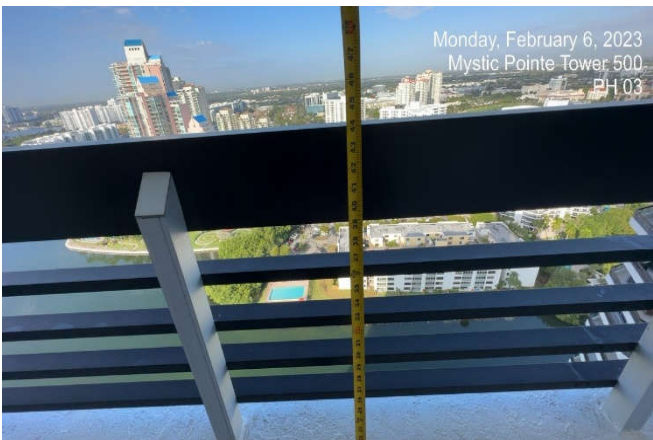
Typical balcony railing height 44” from the finished floor slab
